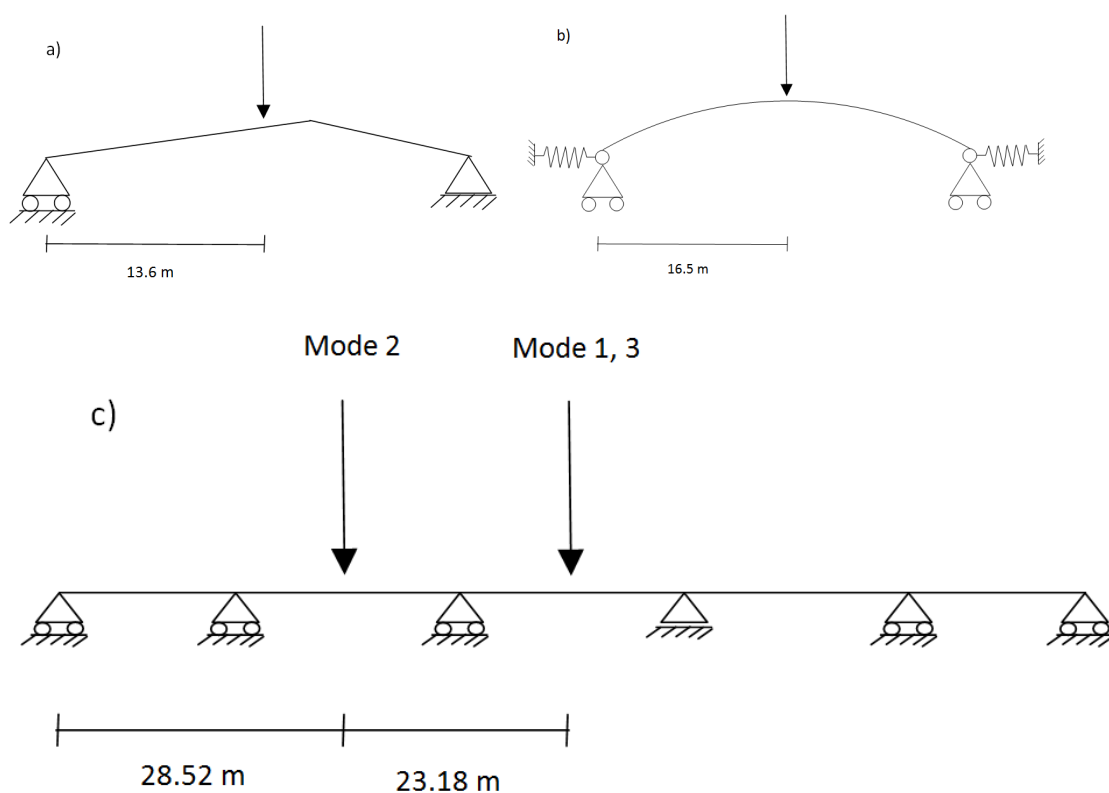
Modeling of the ISO 10137 force model. a) The steel truss bridge, b) The box-beam bridge and c) The multi-span bridge.
